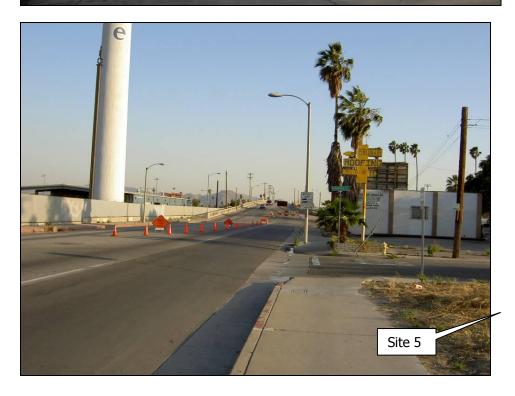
Looking South at Mount Vernon Avenue Bridge.
